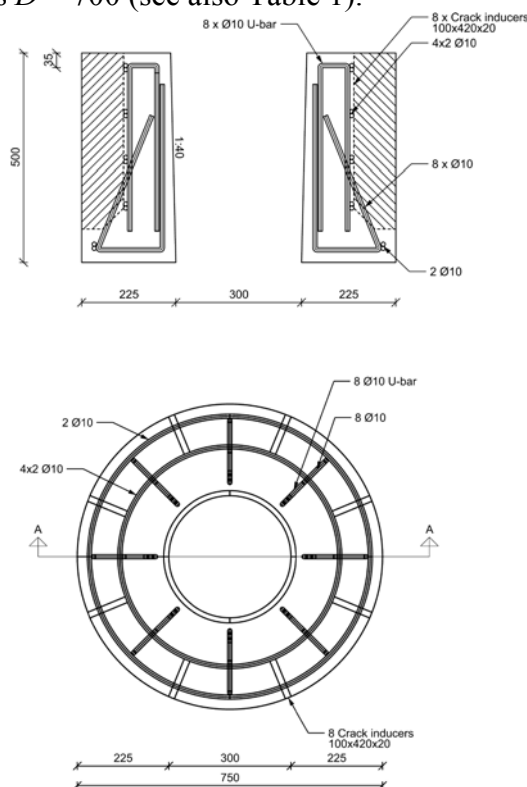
Effective wall thickness of sleeve (top) and position of the eight crack inducers (bottom), reinforcement shown for specimens with low stirrup content.
